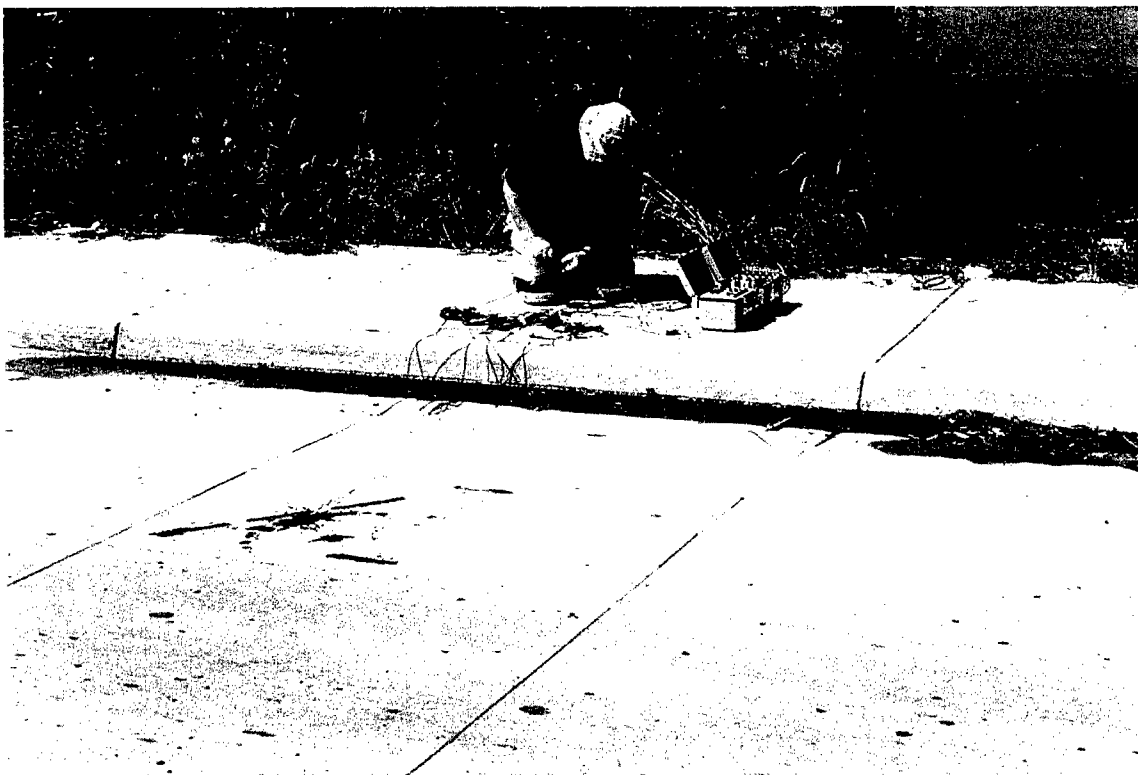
Typical Strain Gage Layout and Load Testing Setup at CDOT Project #1
